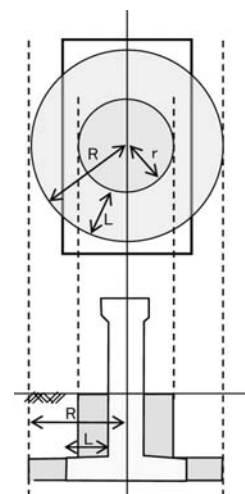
Image of Modeled Pier (upper: plan, lower: cross section)
